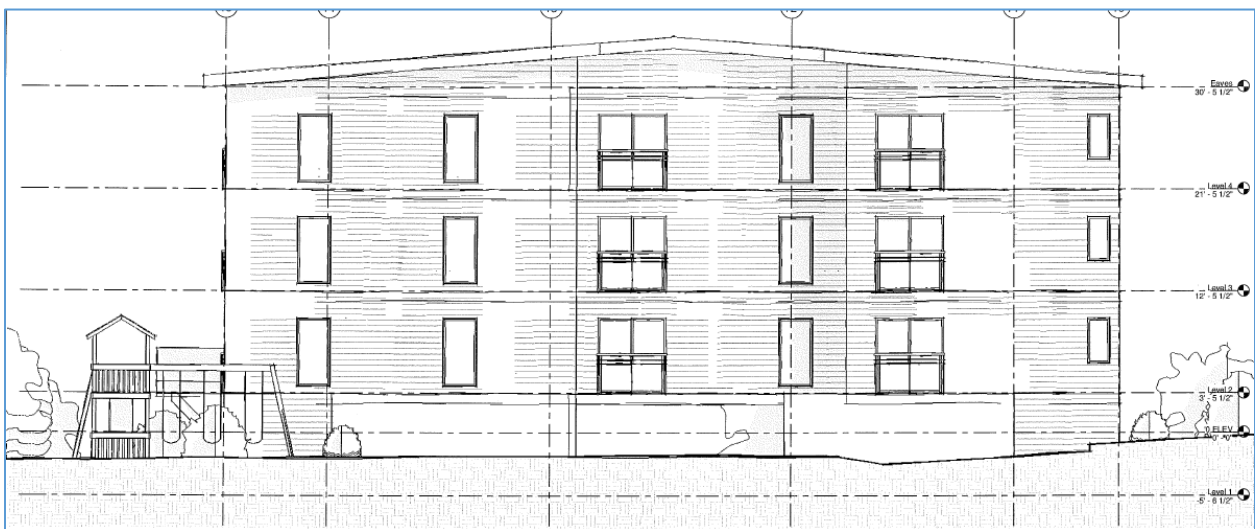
Elevation drawing (2D) as seen from neighbouring multi-family residential property to North on School Road
